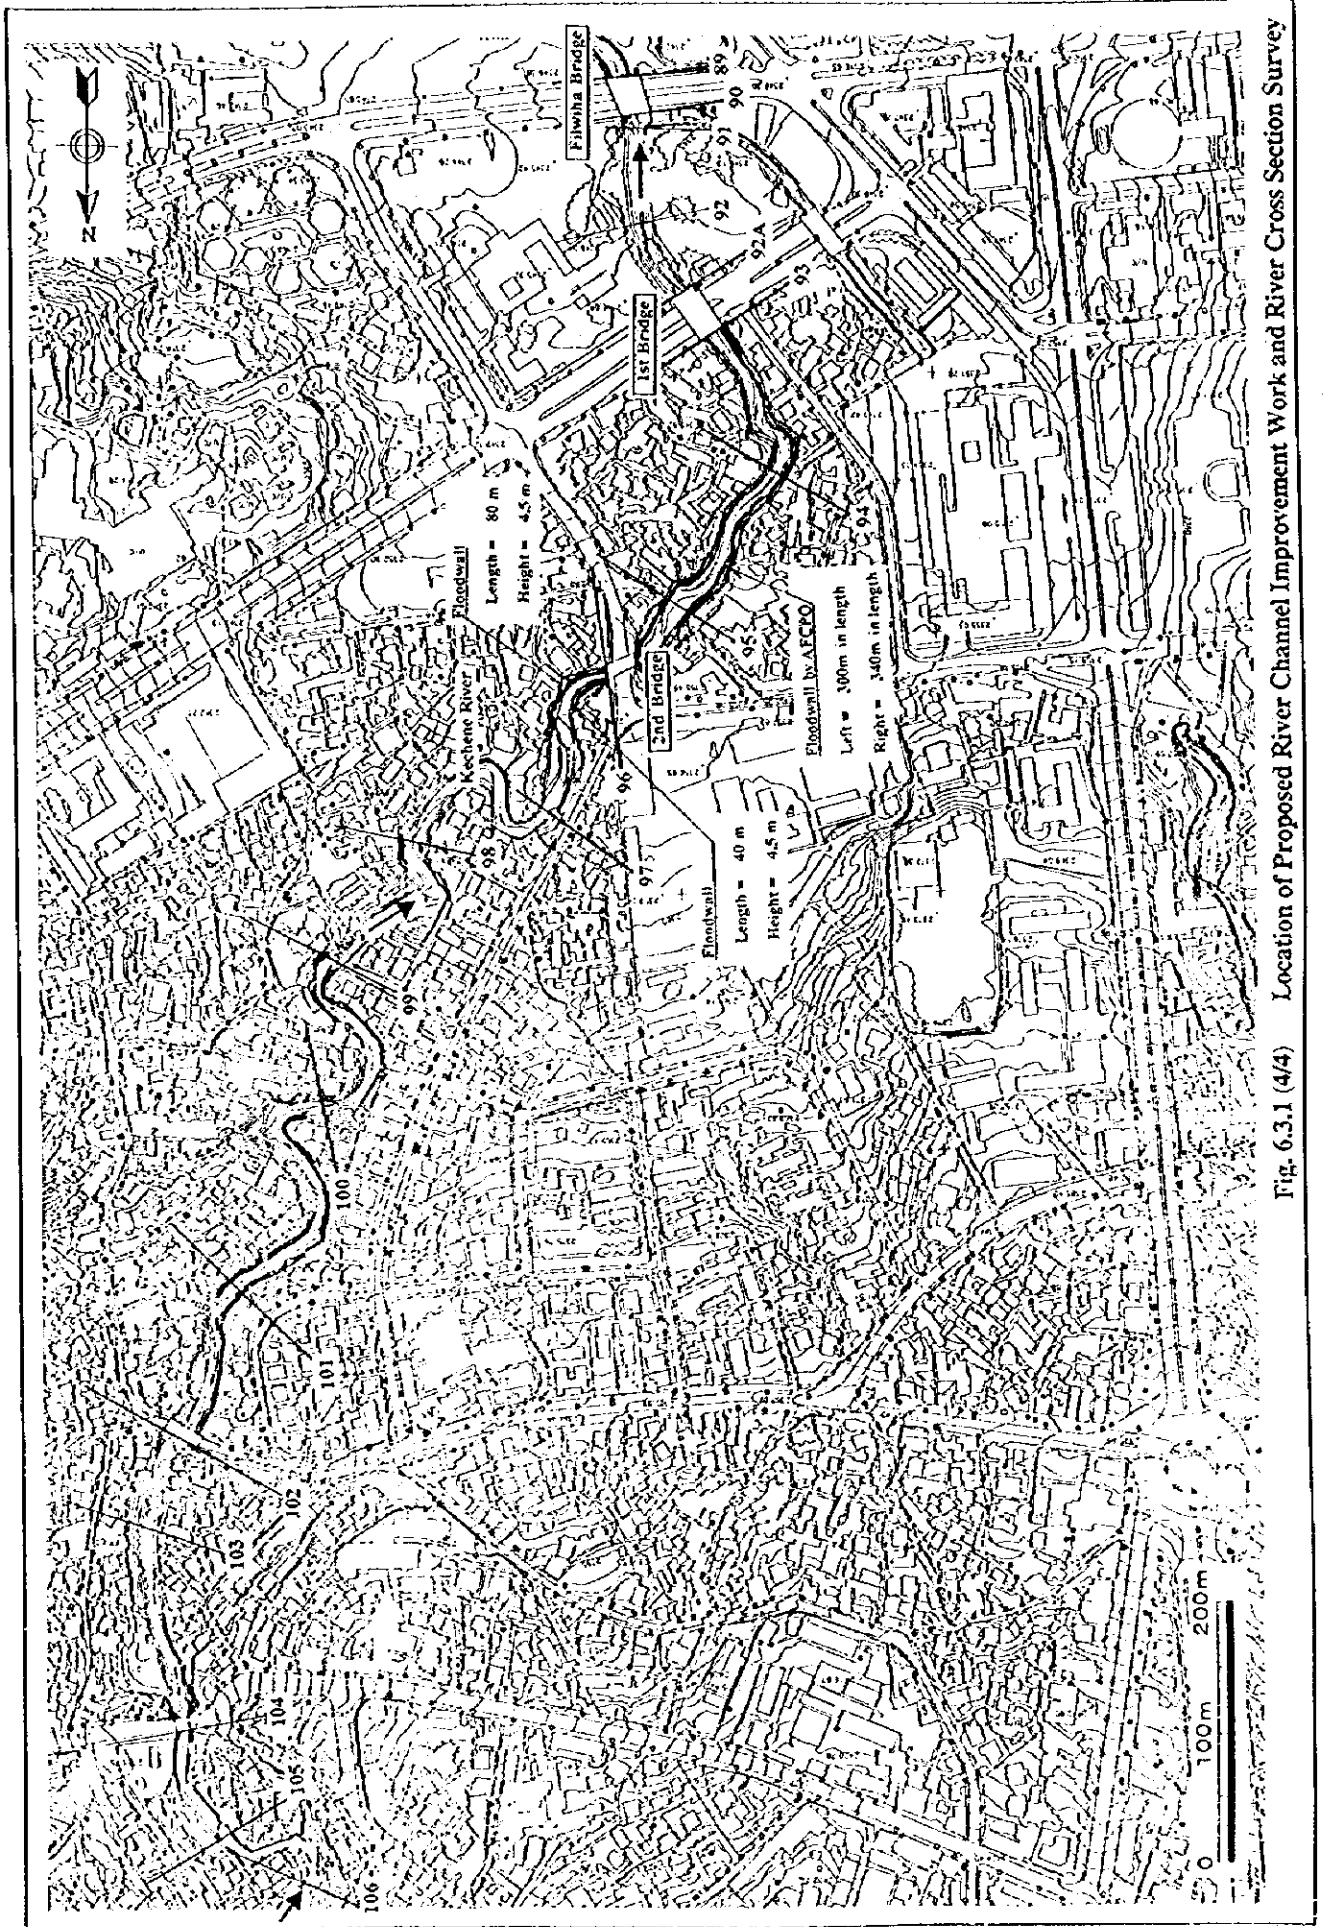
(4/4) Location of Proposed River Channel Improvement Work and River Cross Section Survey
